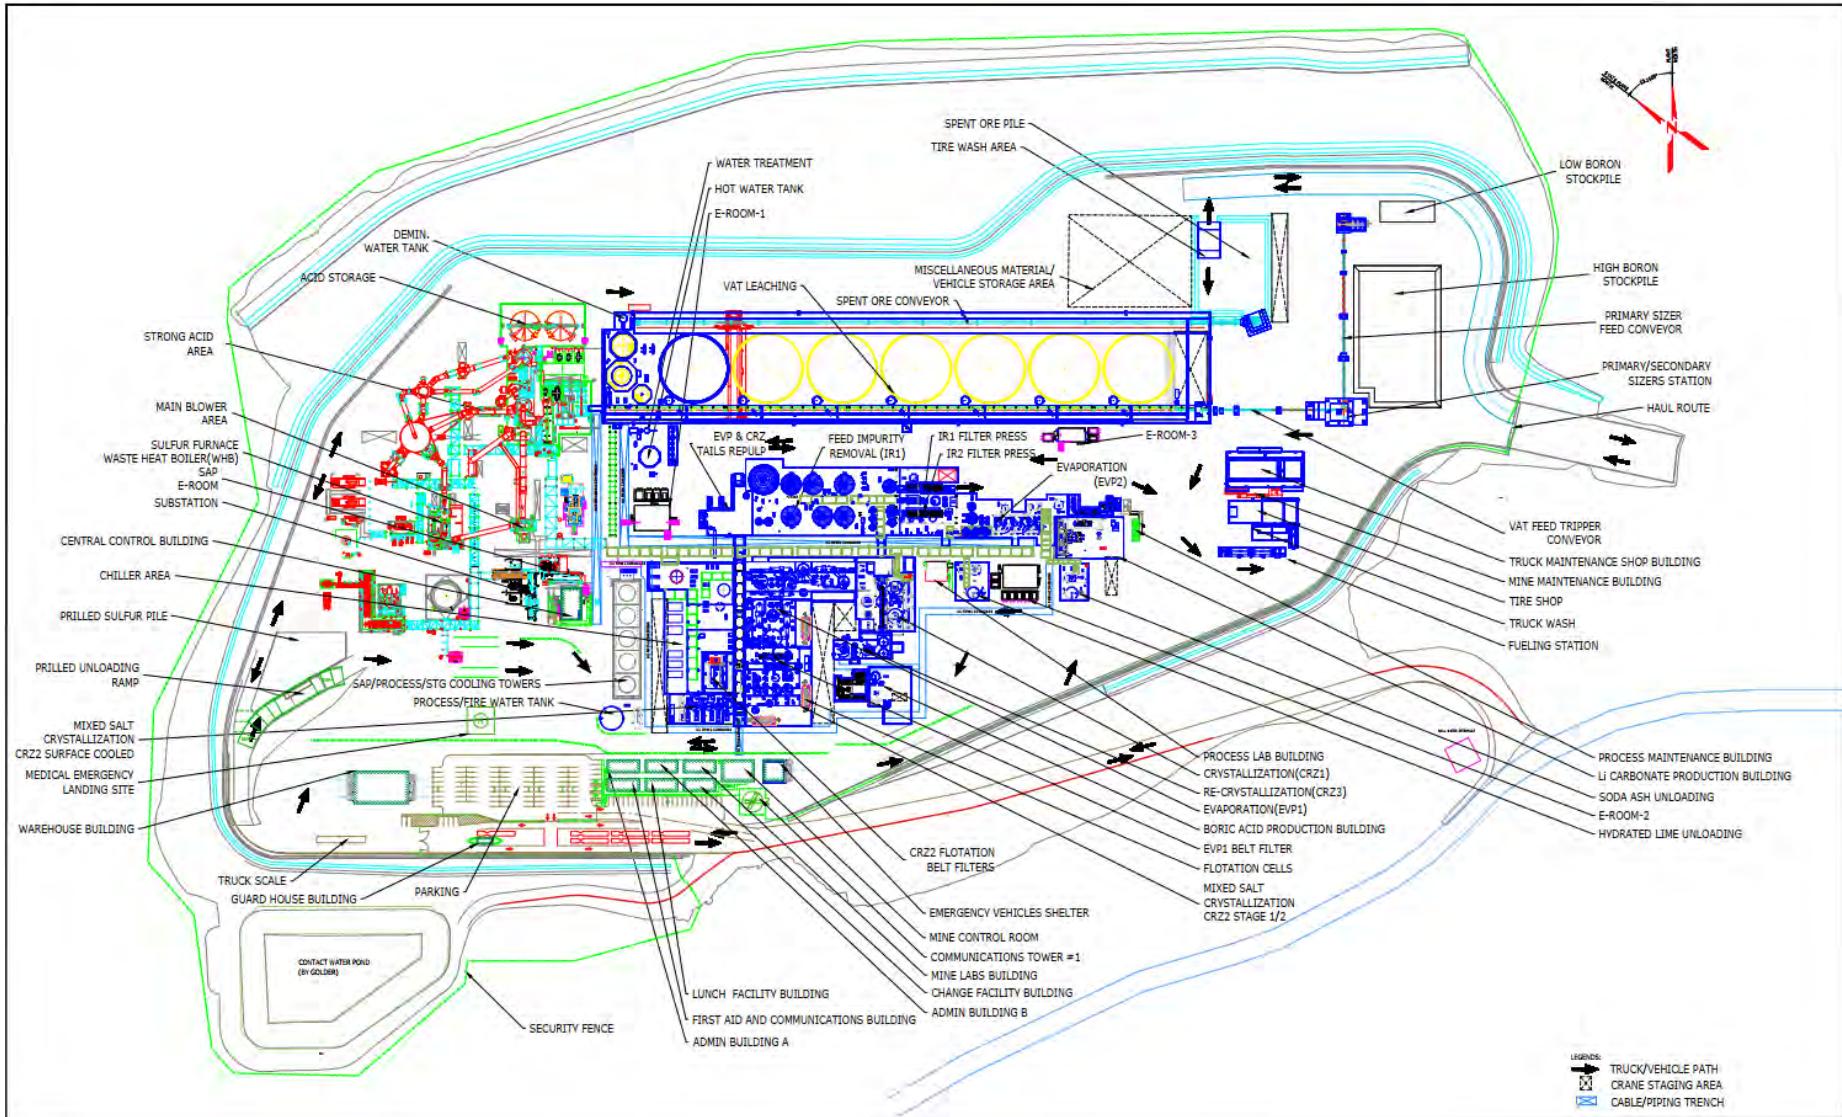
Rhyolite Ridge Process Plant Layout
